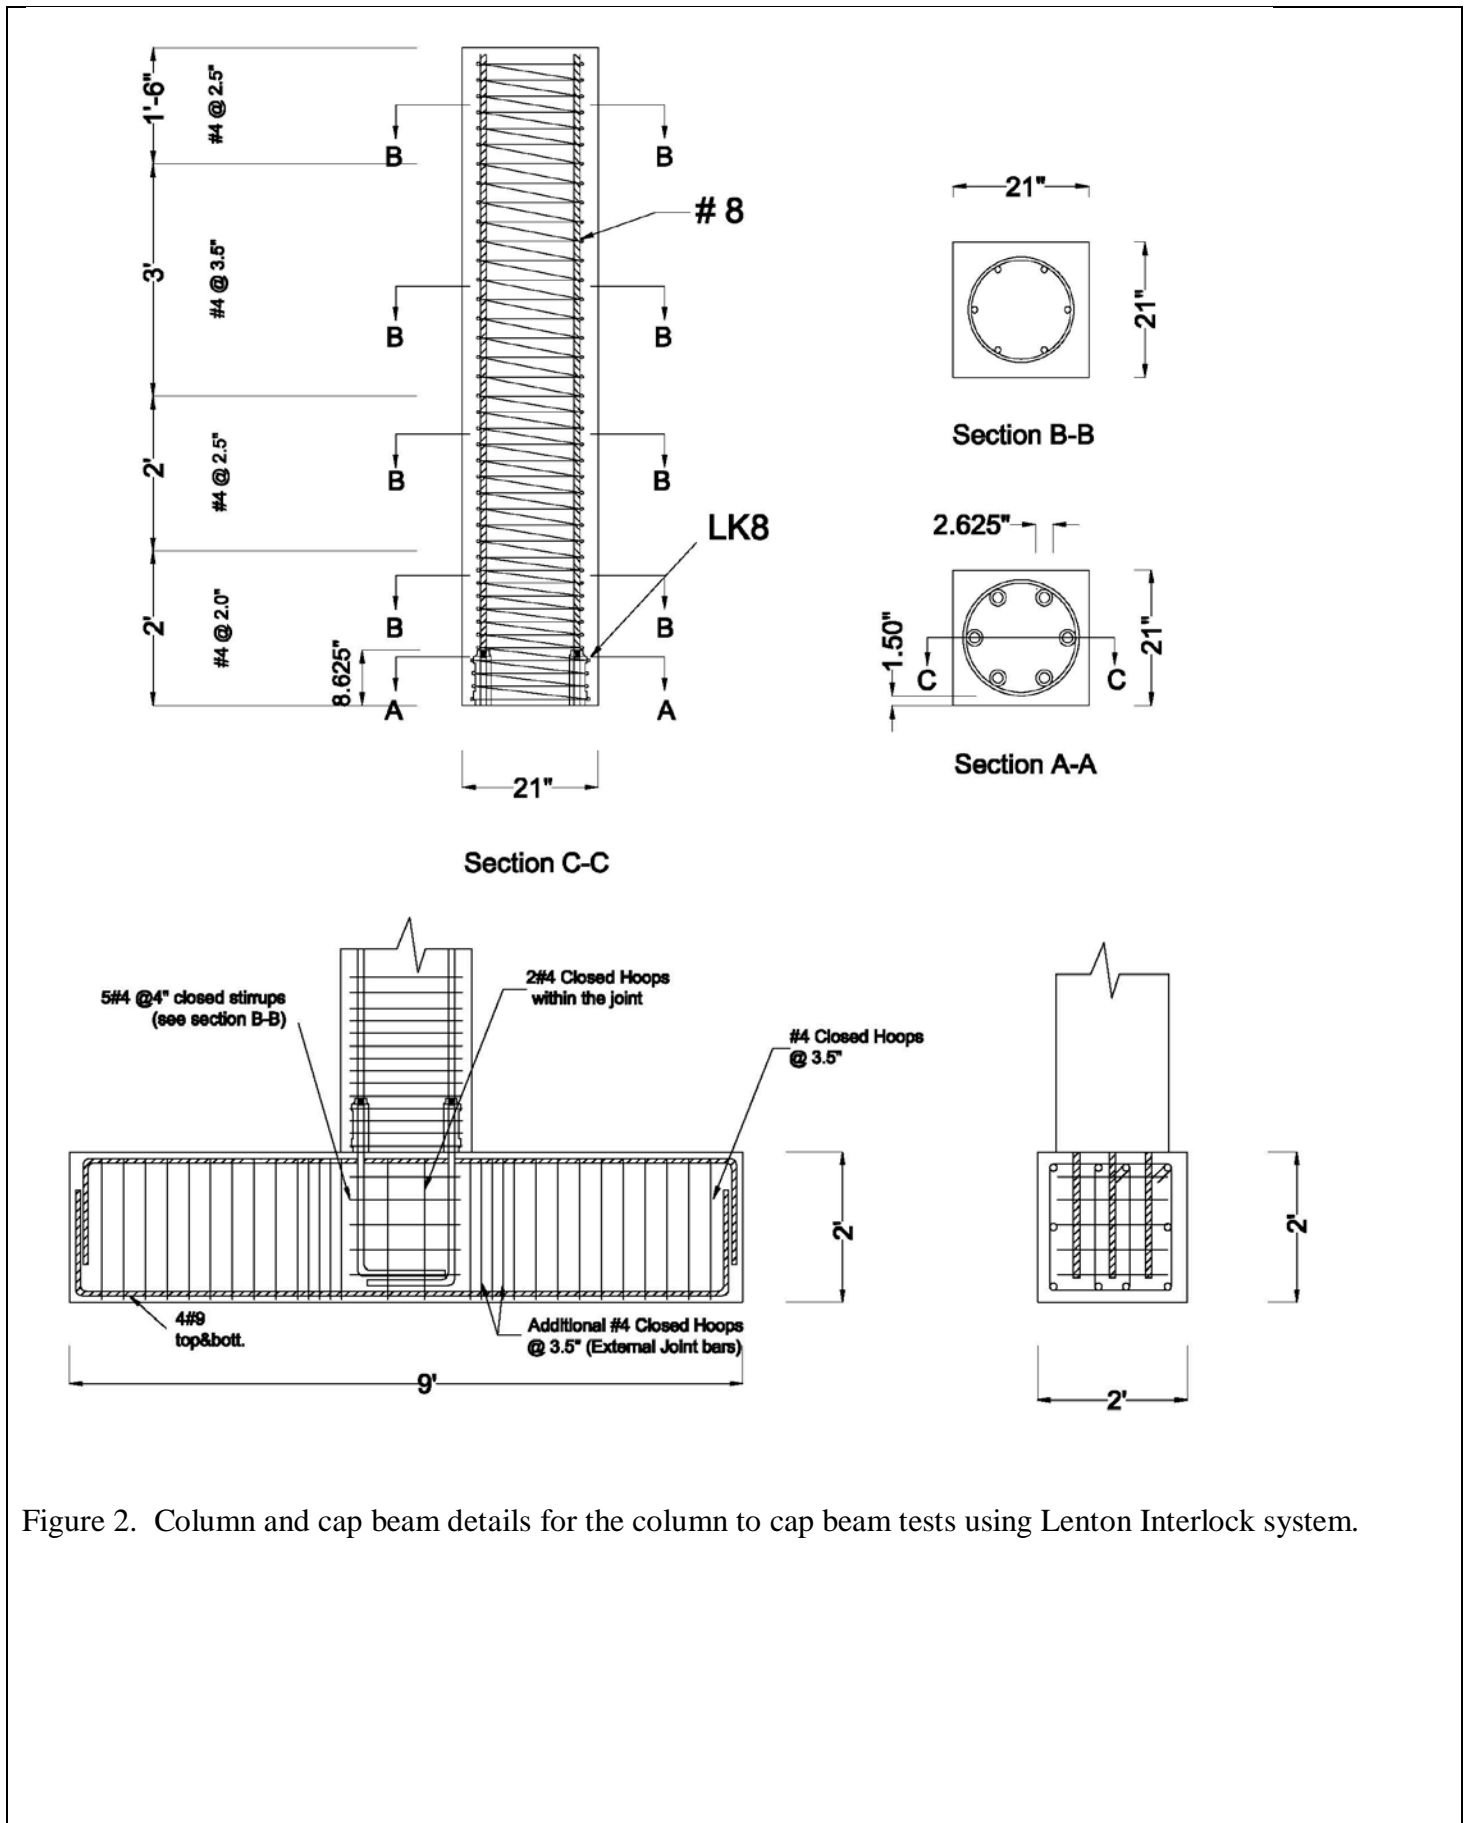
Column and cap beam details for the column to cap beam tests using Lenton Interlock system.
